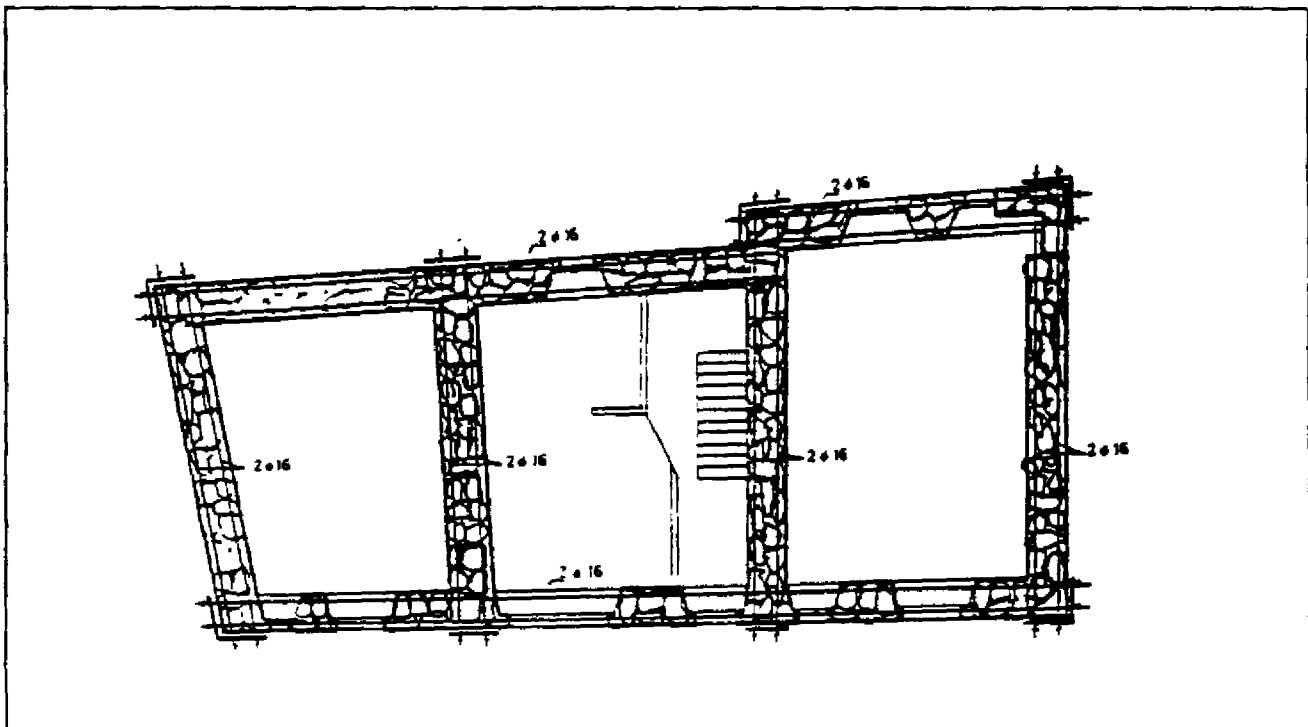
Horizontal Strengthening of Rubble Stone Masonry by Steel Ties [3]
